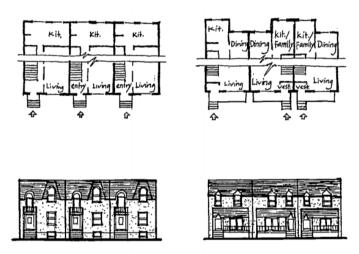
Two common arrangements of outdoor private spaces with respect to building layouts
